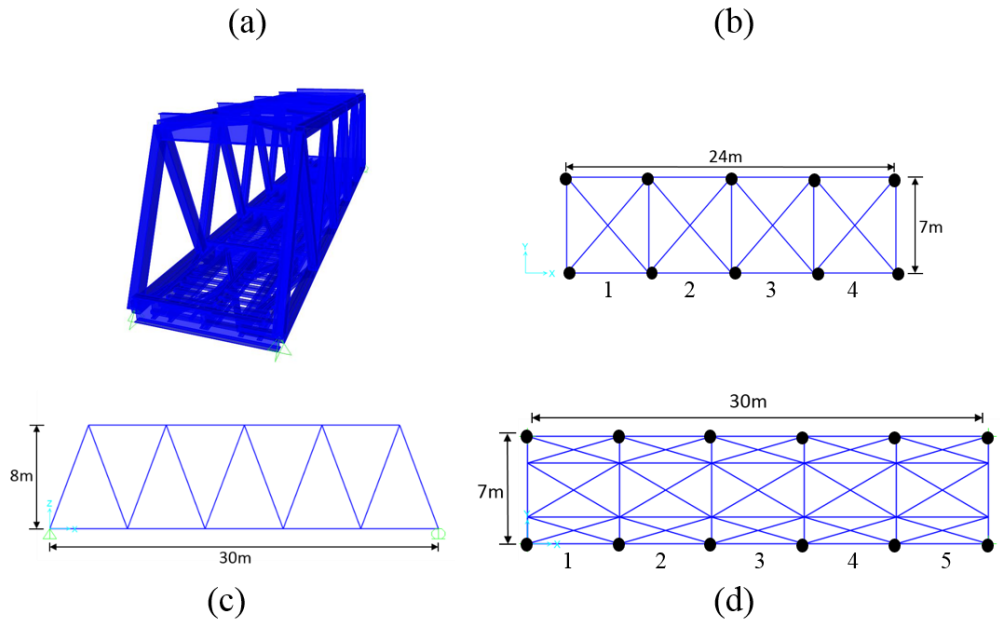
The FEM of the steel truss bridge. Overview, top, lateral and bottom view of the steel truss bridge, in figure (a), (b), (c) and (d) respectively
